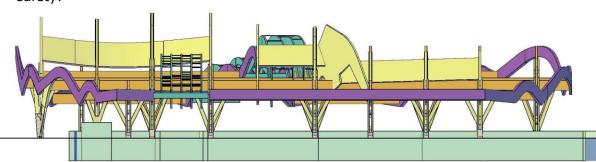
lateral view, main beams and columns (in this view the roof cross-lam panels and the secondary beams are concealed)
